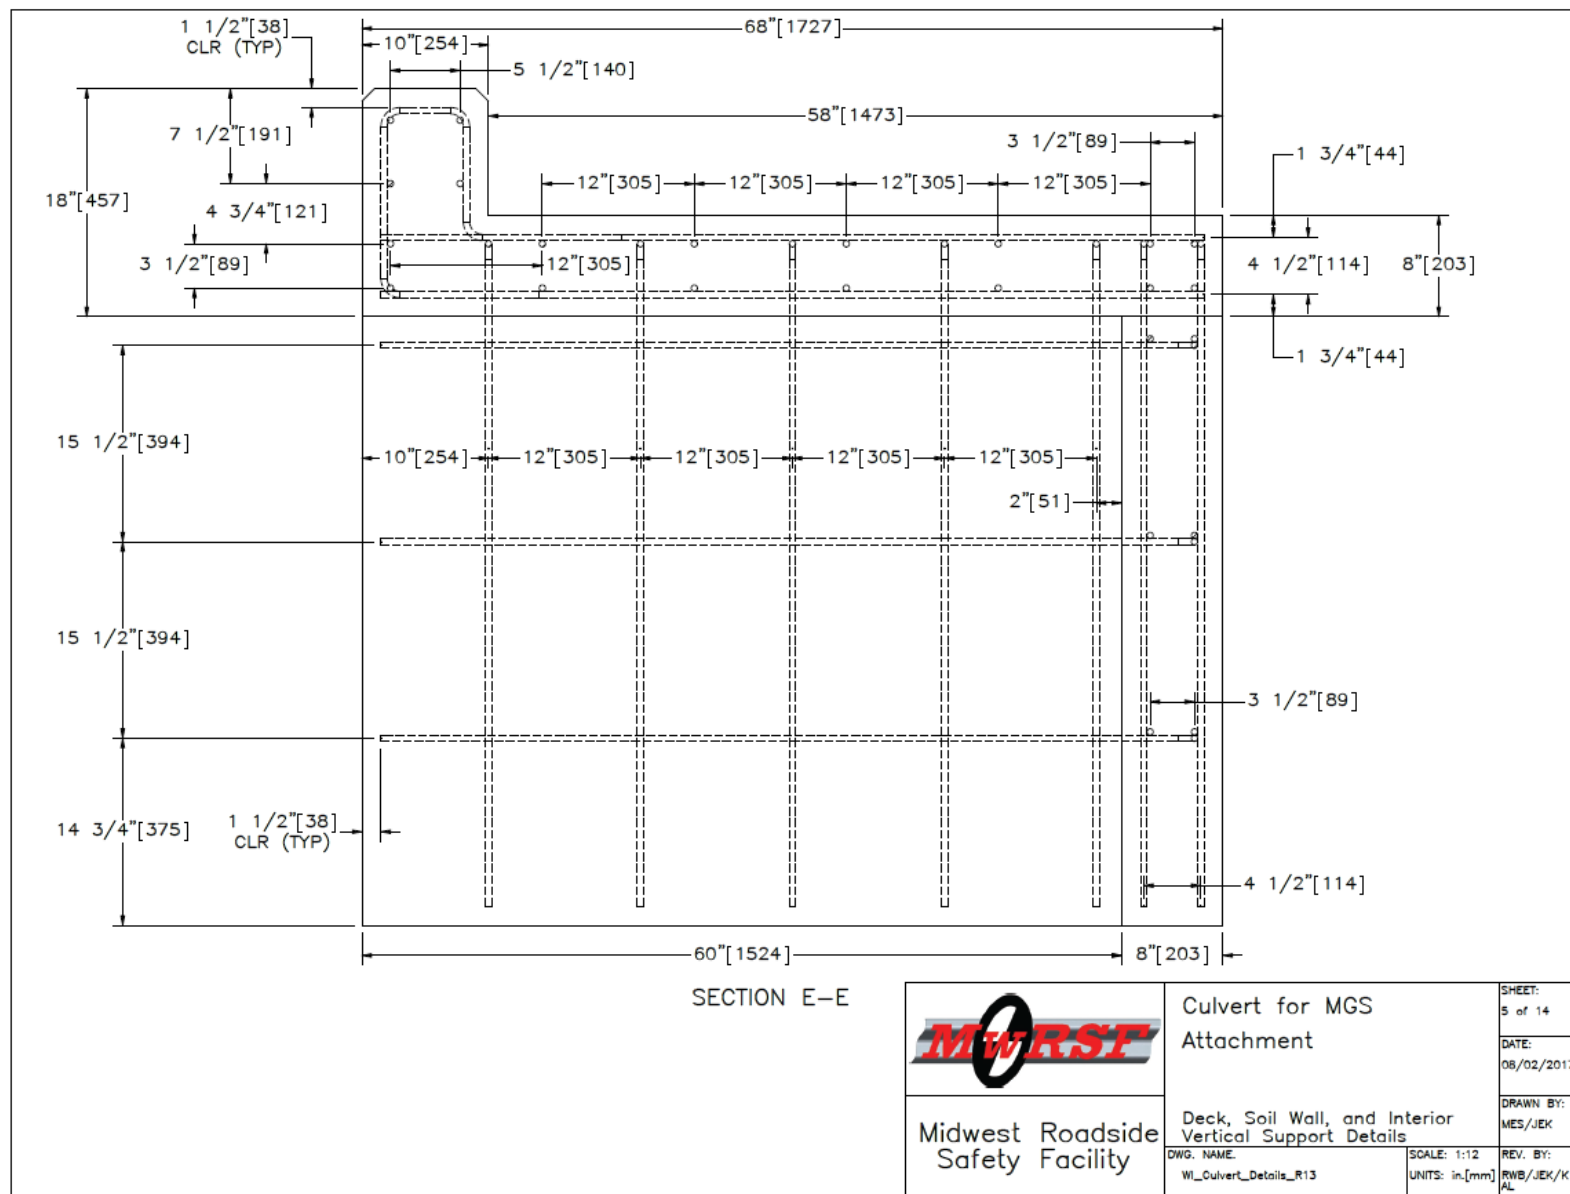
Top Slab, Soil Retaining Wall, Interior Vertical Support Wall Details, Test Nos. CMGS-1 and CMGS-2
